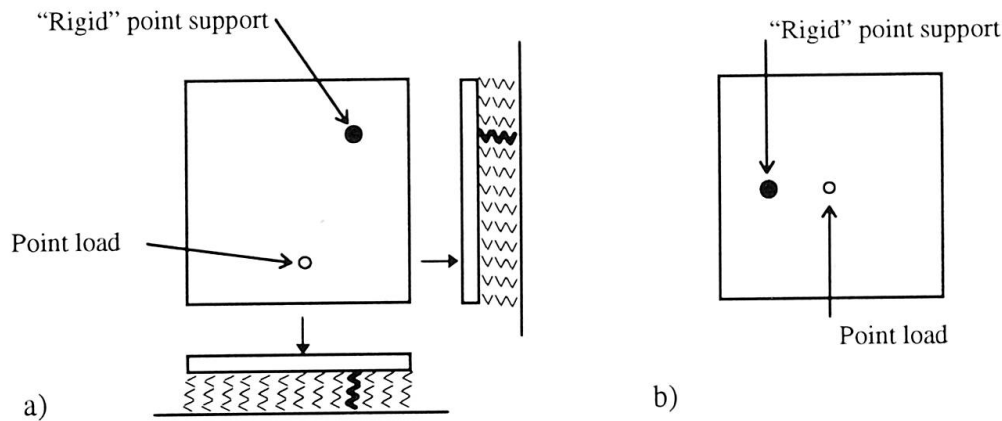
Model of concrete pavement on Winkler foundation (a) and example of load and support locations giving 3 % increased flexural stress (b).
